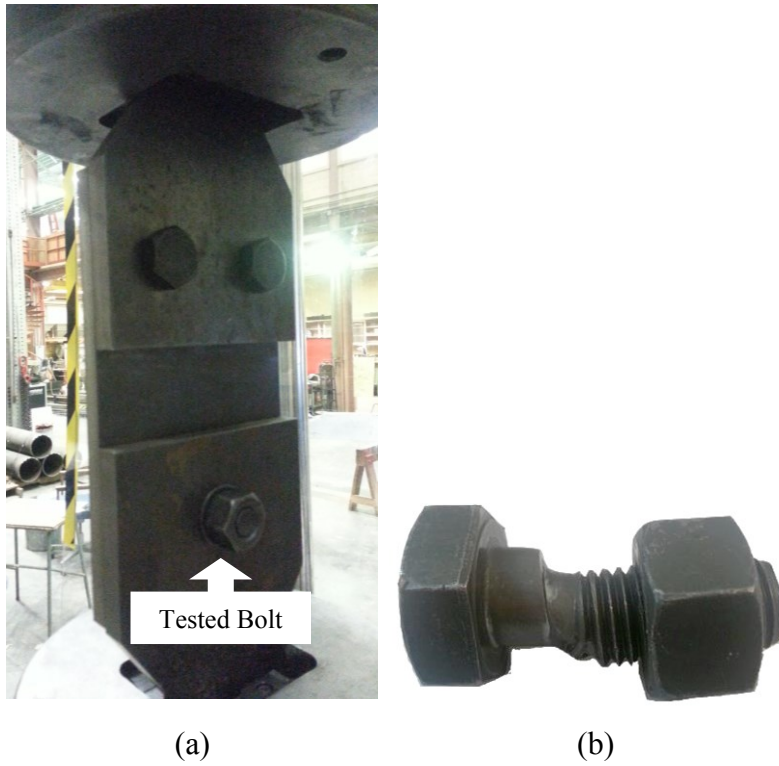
(a) Bolt shear test set-up; (b) Deformed bolt
